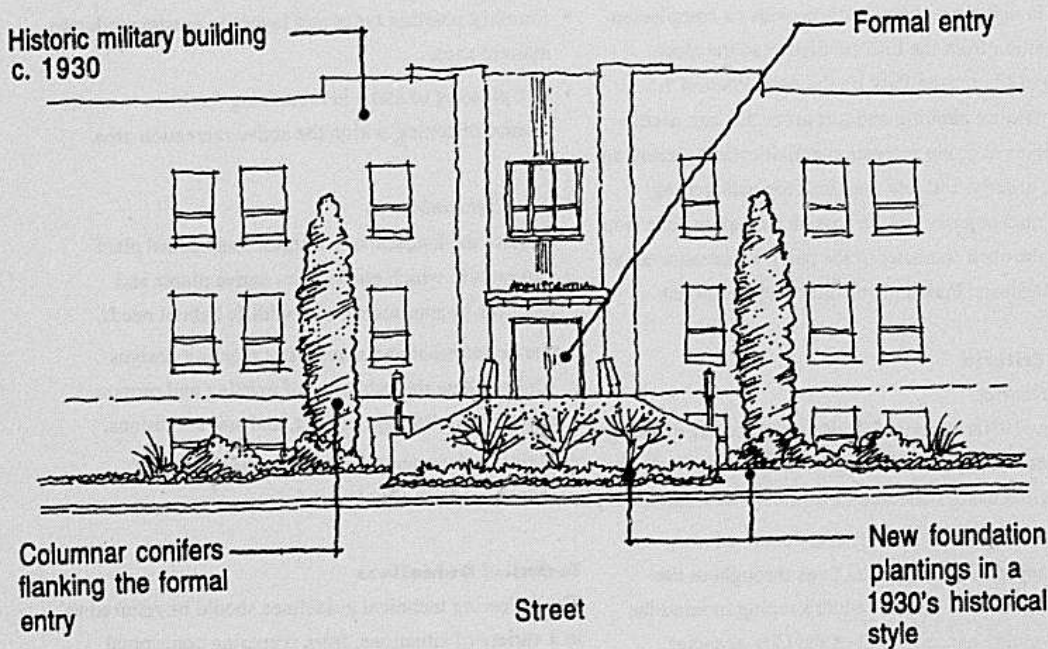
Formal entry landscape at former Navy buildings
